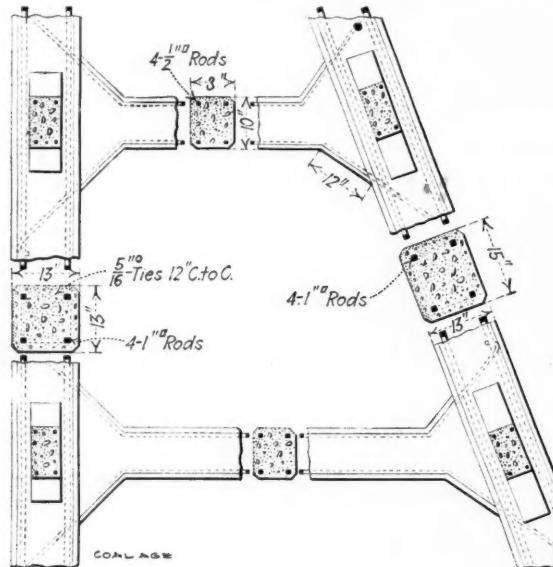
COMPLETE DETAILS OF BENT PANEL
